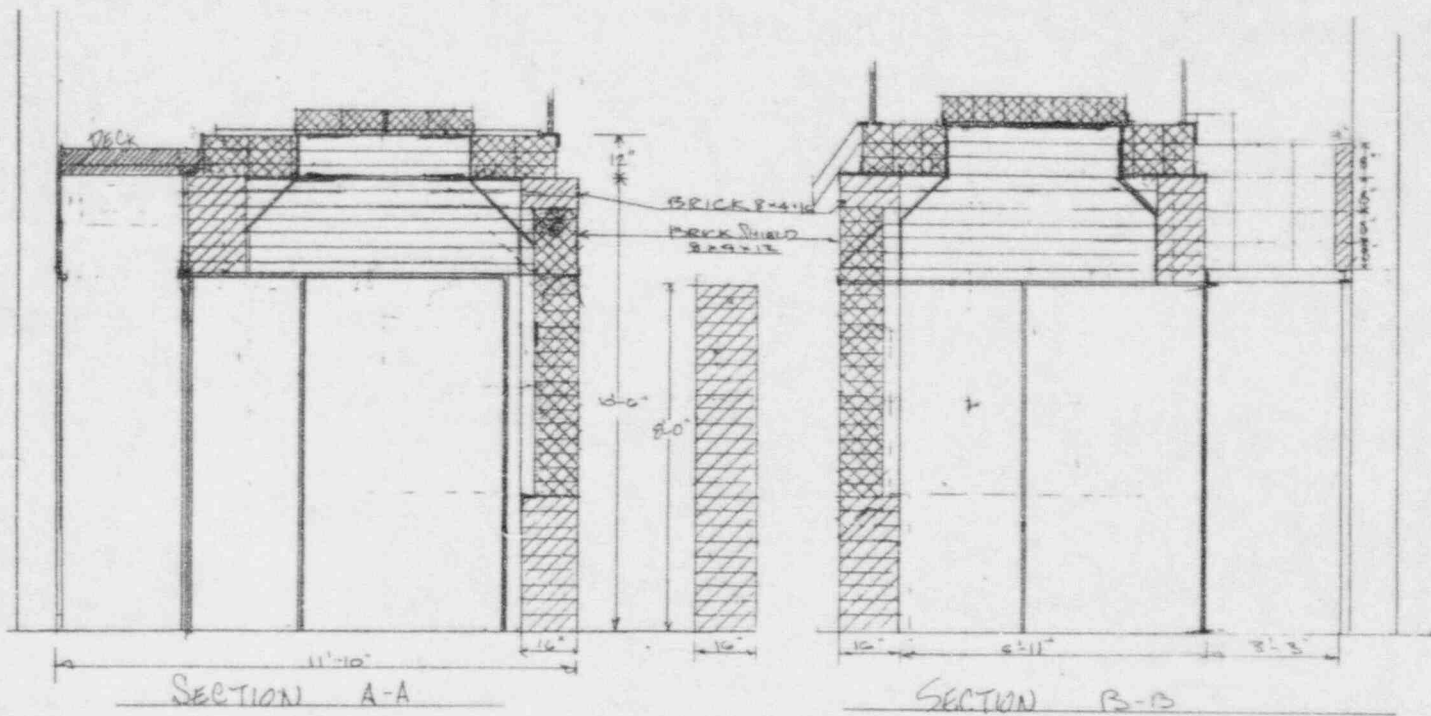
External concrete block shielding for AGN-201 reactor. Section A-A is a cut-away view facing north. Section B-B is a cut-away view facing west.
